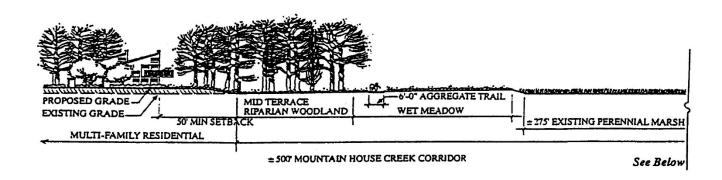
(C) - MOUNTAIN HOUSE CREEK PARK PLAN
